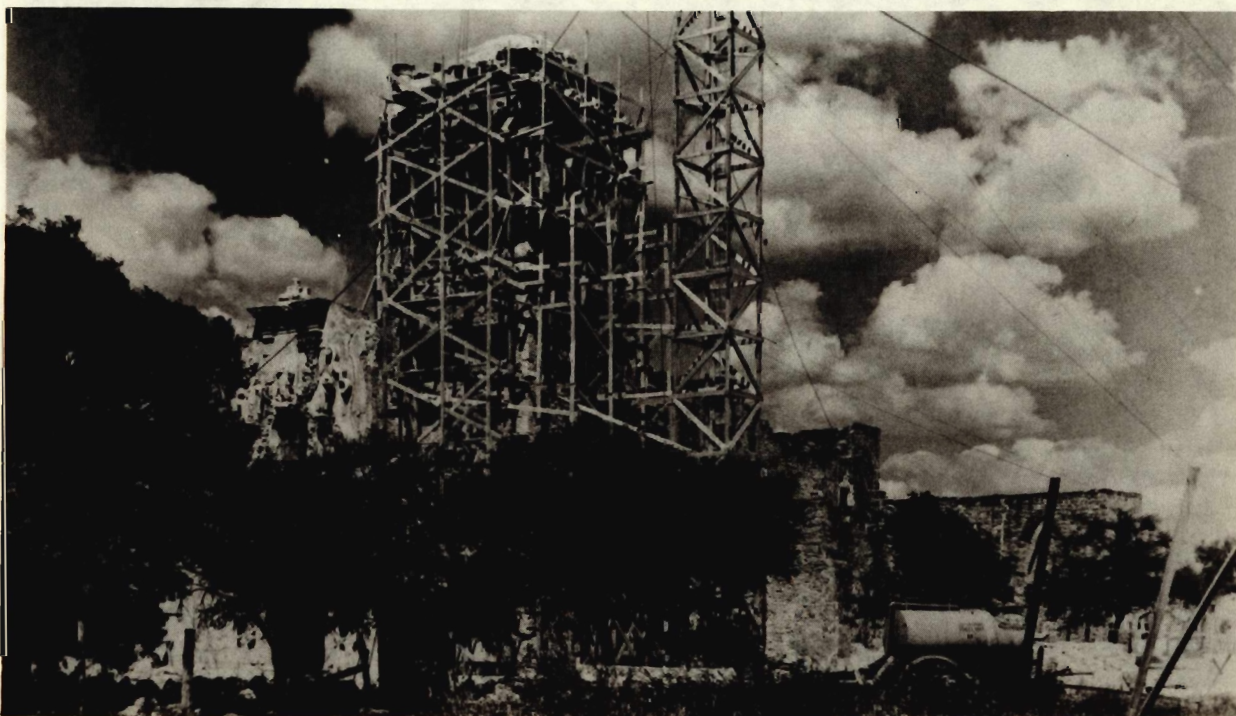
Reconstruction work during the early 1900s, looking northeast (Photo courtesy of the San Fernando Archives Collection).
